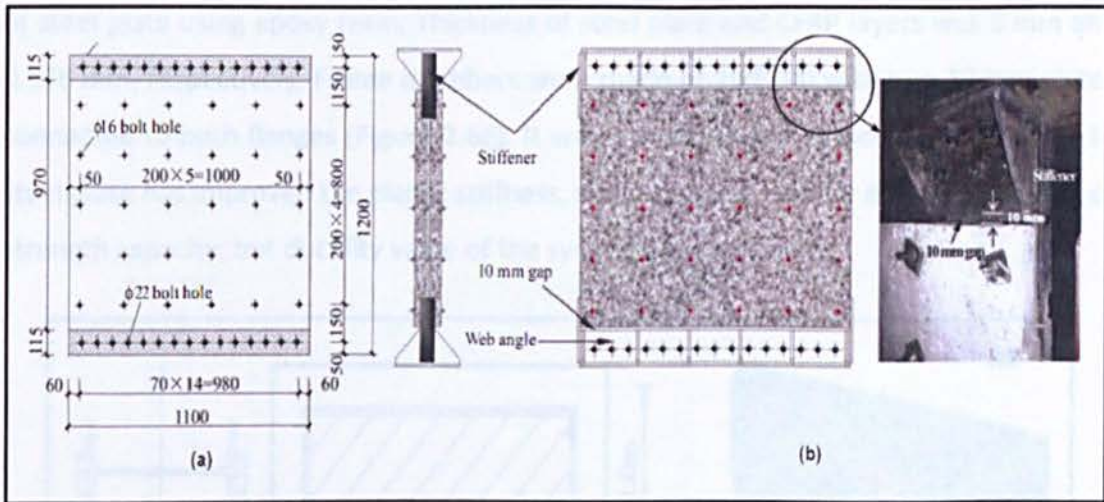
(a) Configuration of steel plate (b) Detail of CSPSW tested by Lanhui et al. (2011)
